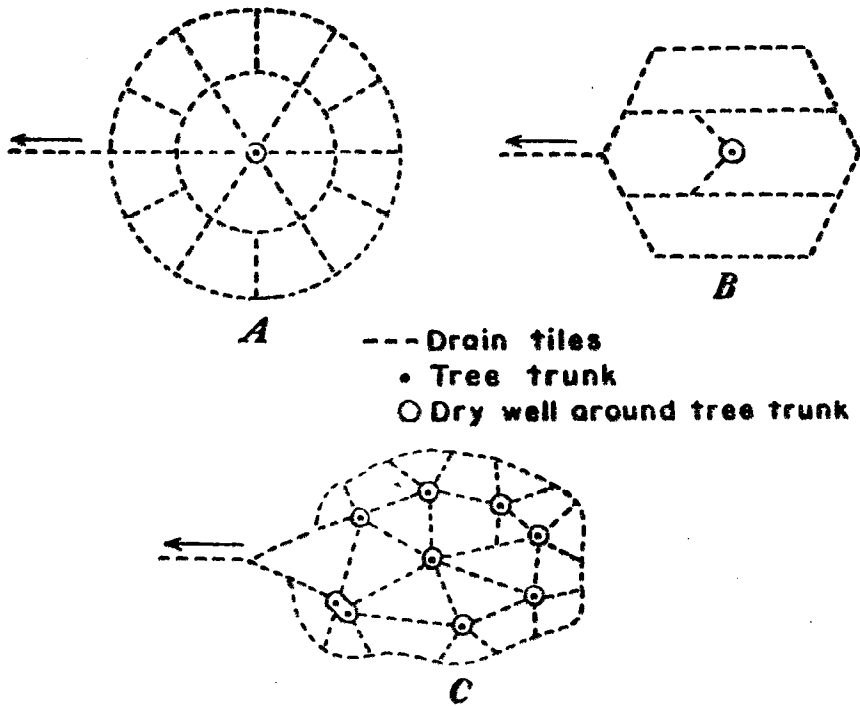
Arrangement of drain tiles on original surface of ground where fill is to be made. Tiles are placed so as to drain in direction indicated by arrows. A, Tiles laid in lines radiating from tree trunk and connected to drain off water at outlet. Center of pattern only may serve for small tree; for larger tree, additional drainage may be provided by extending tiling as indicated. B, Parallel lines of tiles sometimes may be used advantageously. C, Suggested arrangement of tile drains for group of trees.
